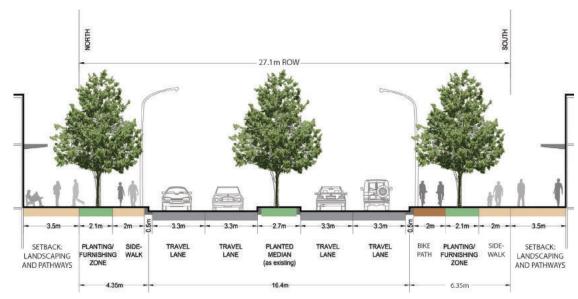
Street Type B1 (Southwest Entrance - Wide)
